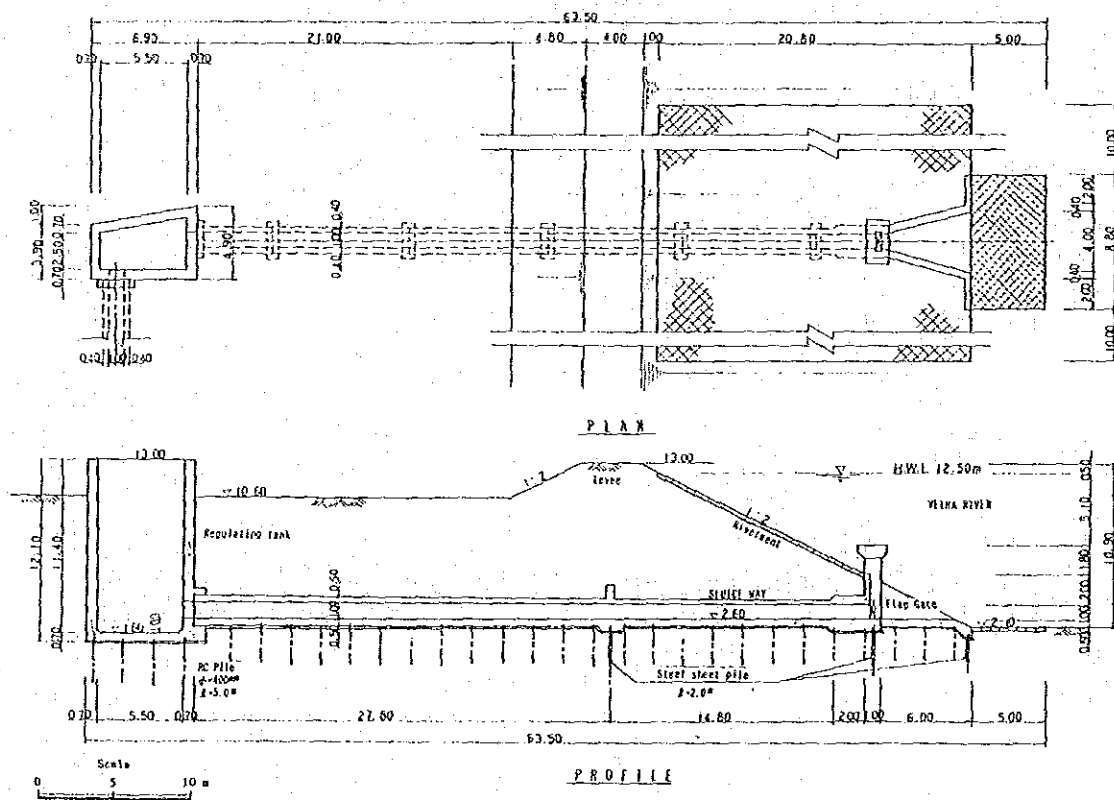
PROPOSED PUMPING STATION AND SLUICeway
